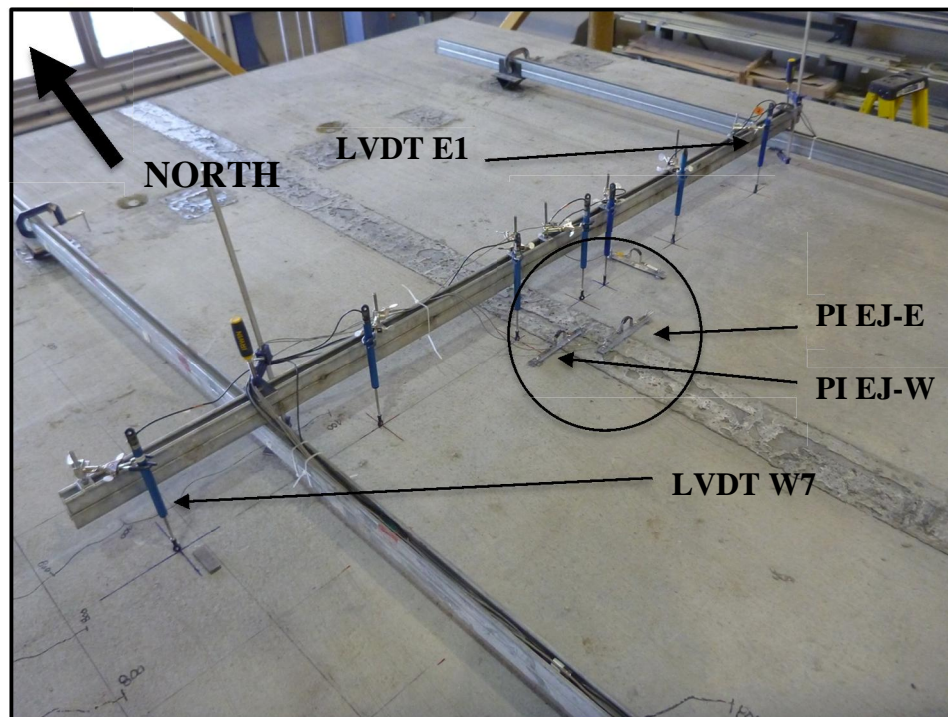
LVDT and Pi-Gauge Set-up (Test #4)
